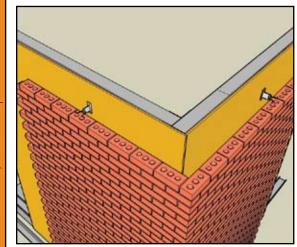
Brick Veneer on Steel Studs – Warping Corner.
